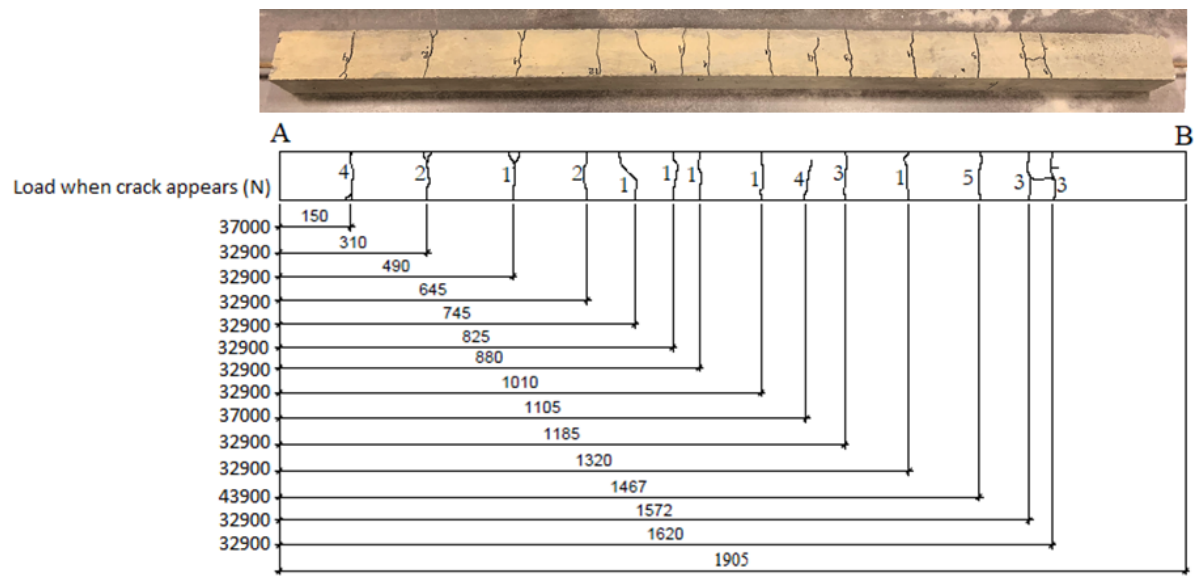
Prism test and crack pattern: #4 sGFRP – specimen 2.
